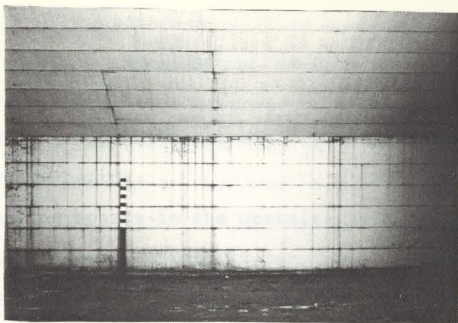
West wall of north bedroom upstairs showing extensive water stains.
